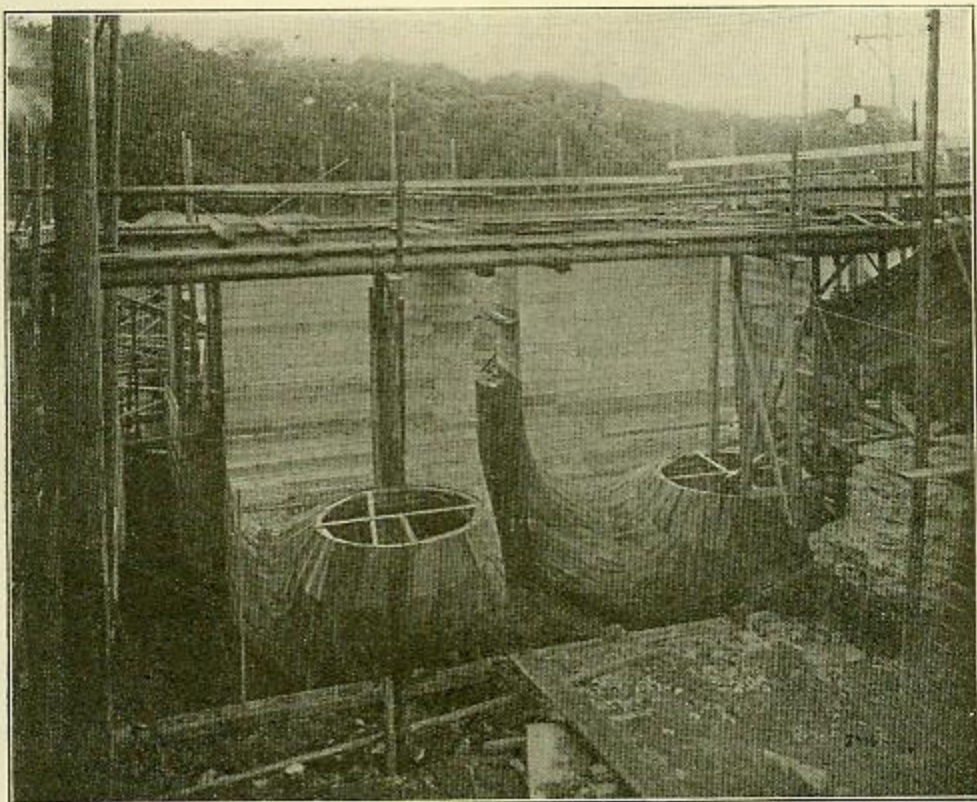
Wooden Form for Concrete Draft Tubes.
